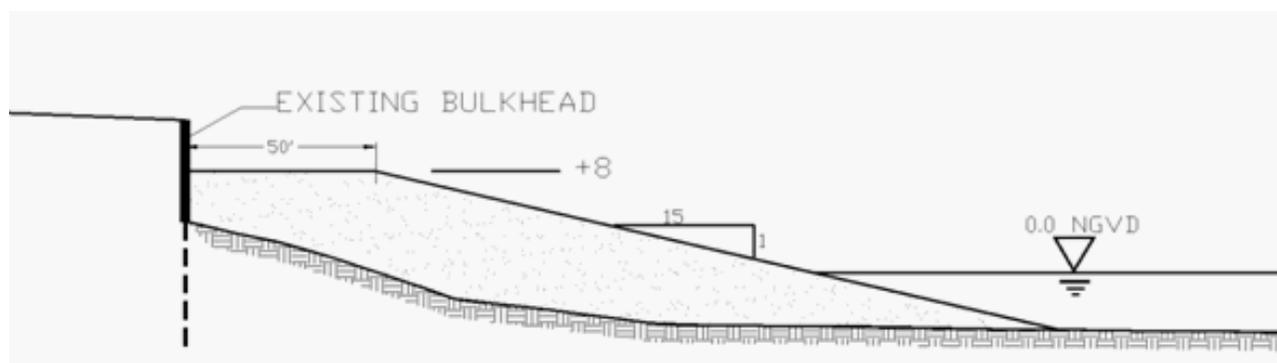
Typical Berm Fill Section in front existing bulkhead (Advance Fill not included)
